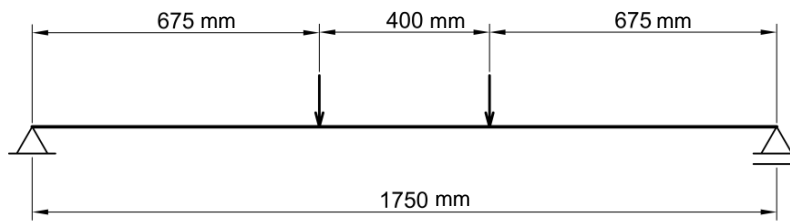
Test loading arrangement (Buckhouse, 1997, cited by Wolanski, 2004)
